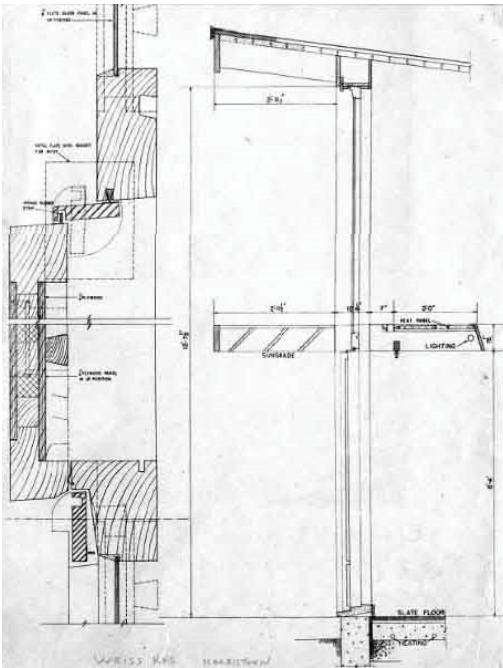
Drawing of north elevation. Source: (Author 2018)
